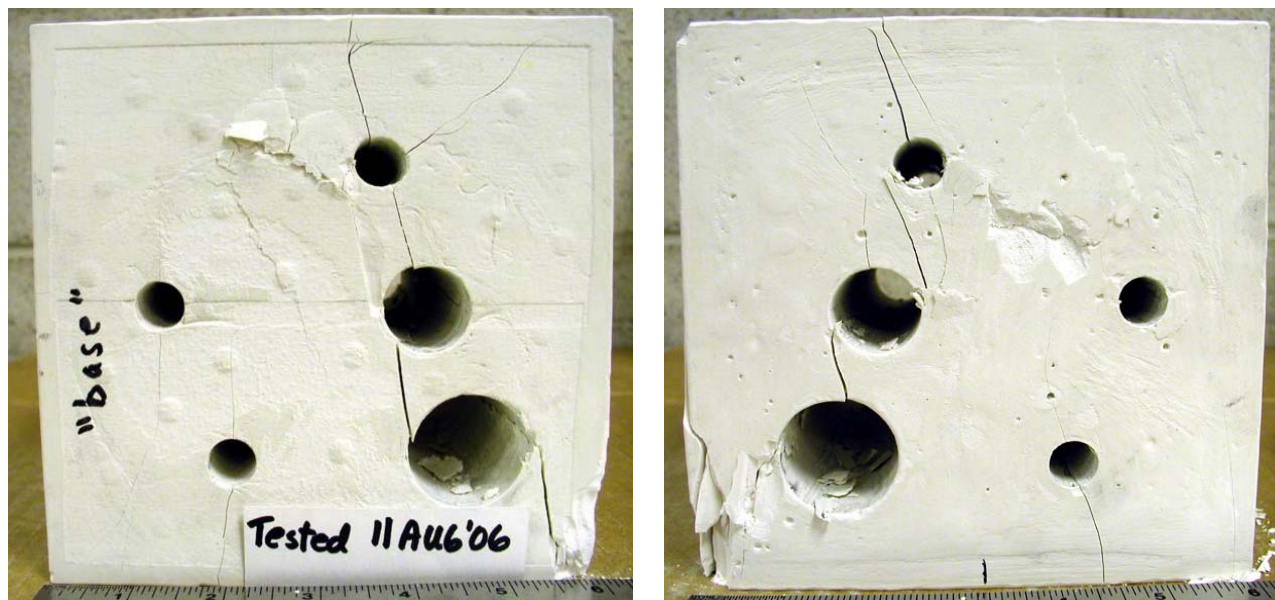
Post-test Failure Photos (front and back) of Specimen QA-PB-XCL1M1S3-P7-A
